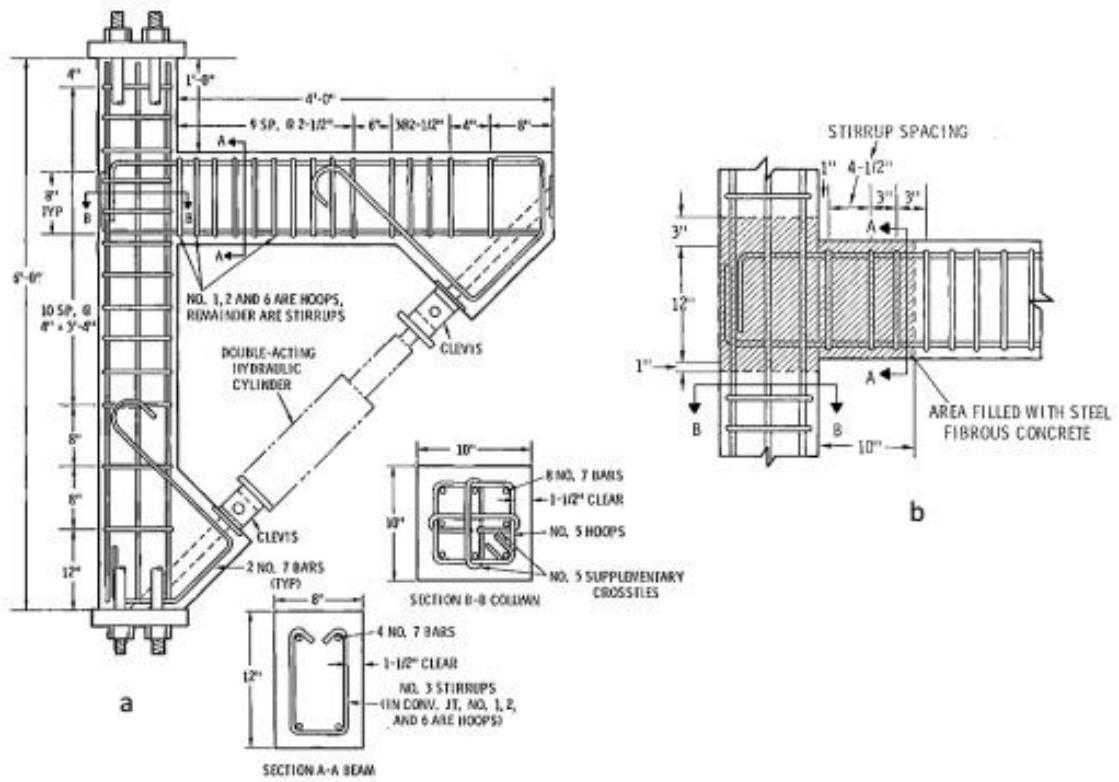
Details of the tested specimens, a) ductile specimen, b) modified specimen [26]
